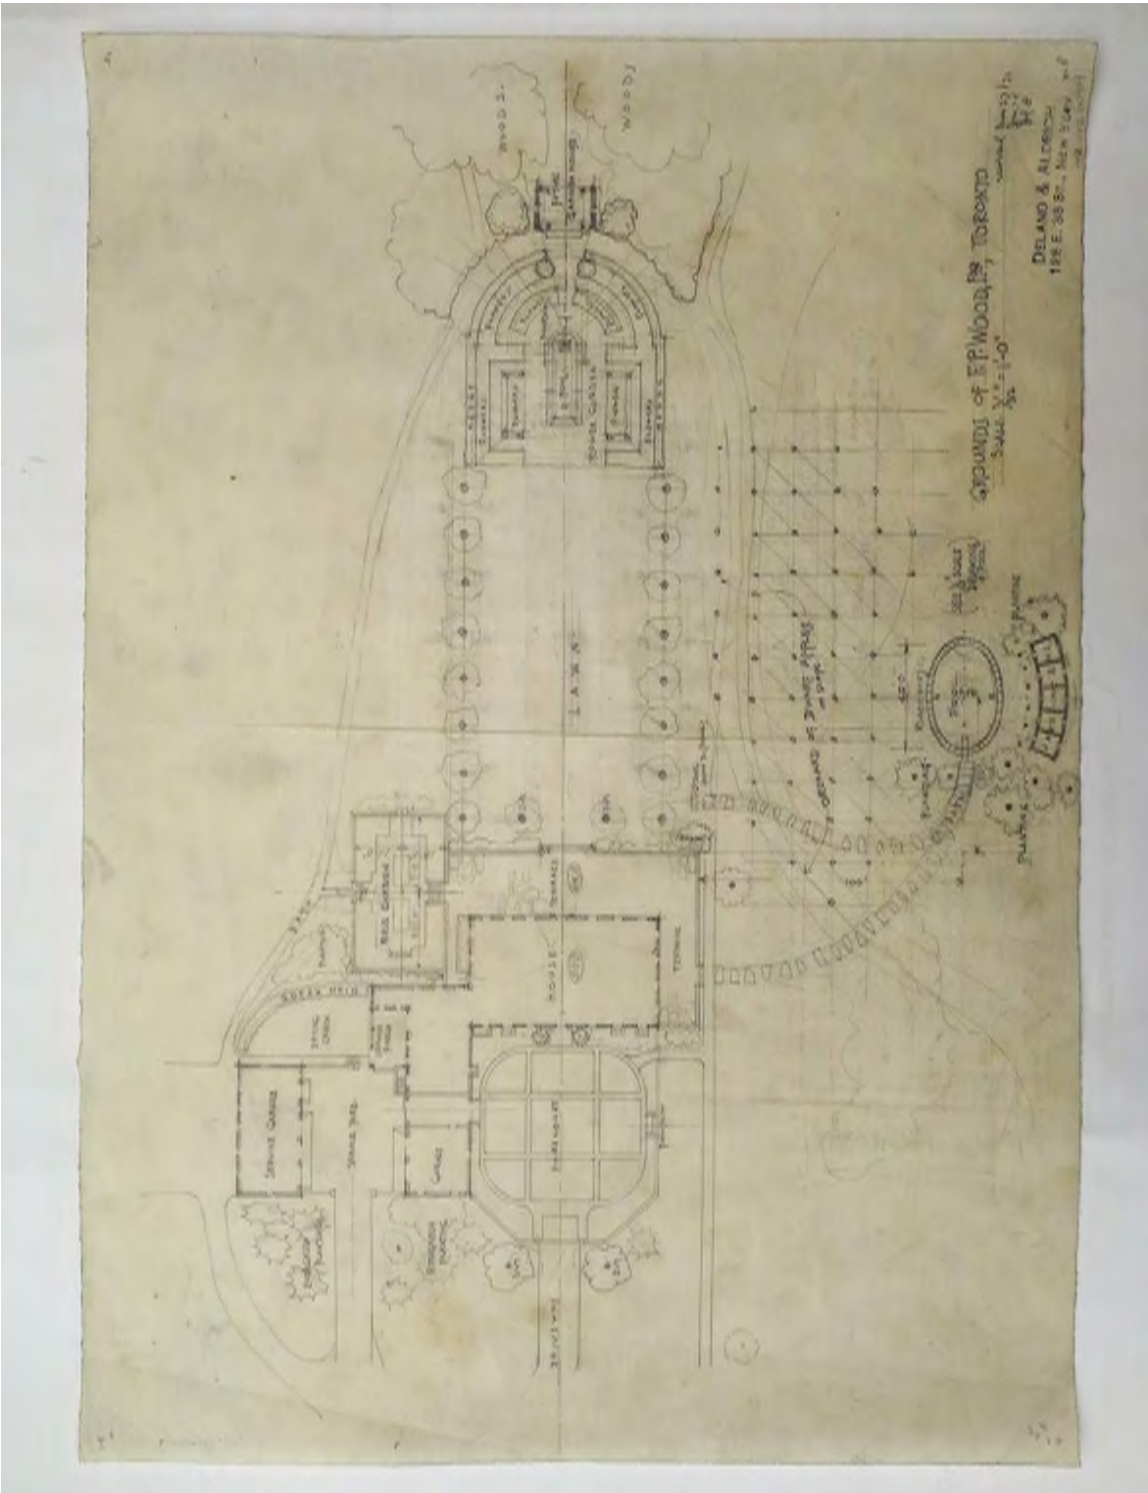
Ground plan of the Frank P. Wood estate, 1931 (Columbia University, Avery Library, Delano & Aldrich Fonds, House for Frank P. Wood, Grounds Plan, March 27, 1931).
